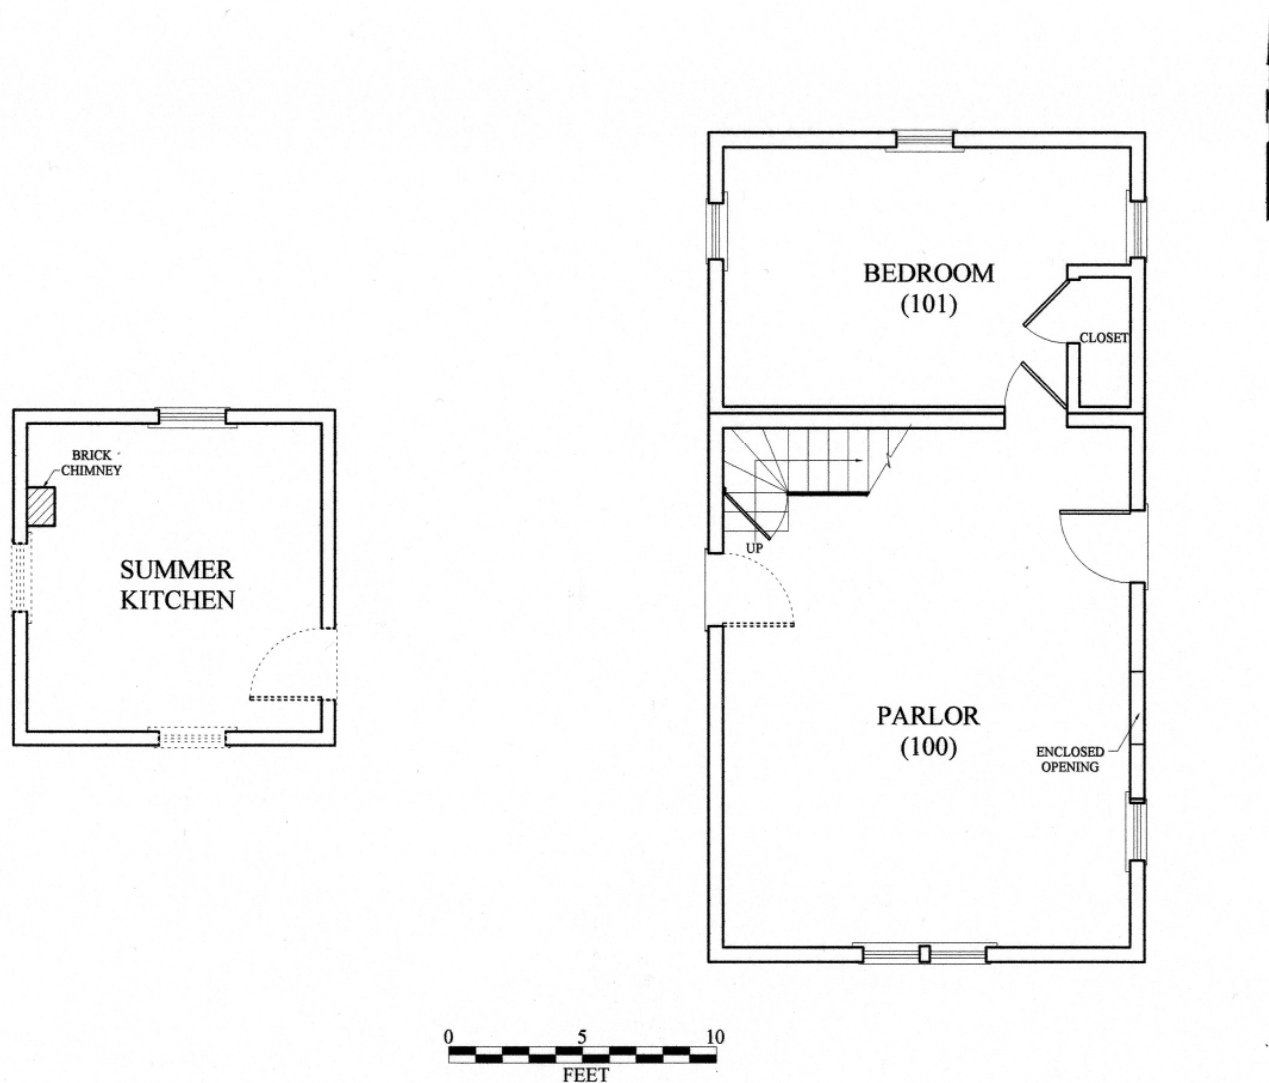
First floor plan of the residence showing conditions circa 1910, following the initial expansion of the original house. The summer kitchen remained detached from the house at this date.
